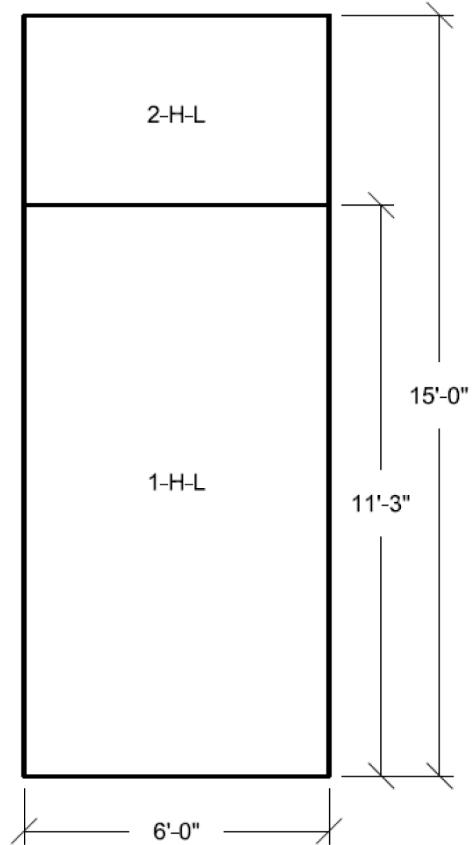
H.6-180B DGFOSV Wall 10 Looking From Outside Transverse Reinforcement Zones
